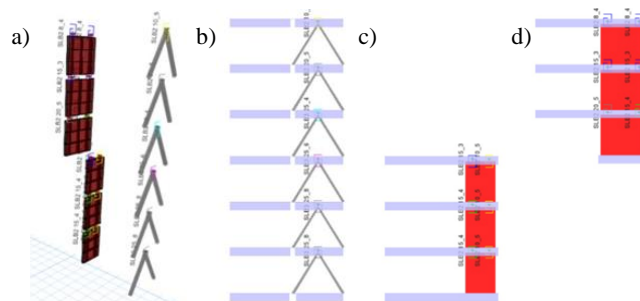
Elevation of SLB heatsinks, used in the type B model.
